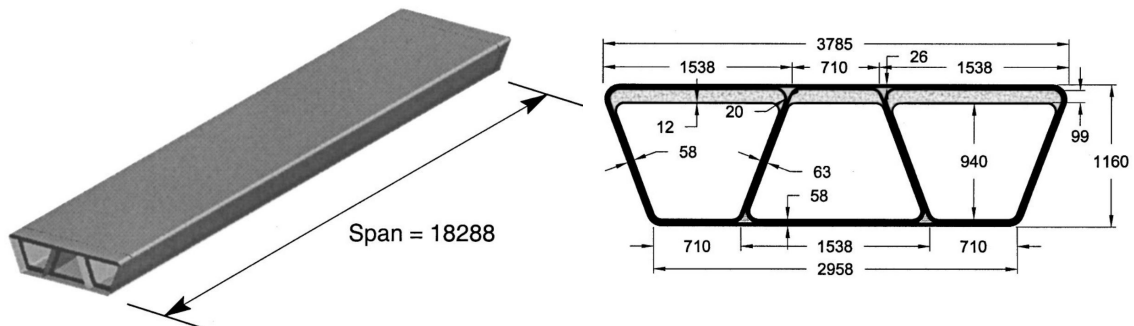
3D view and section of an FRP - concrete bridge deck. Concrete is placed in the compressive part of the section. [Kitane et al., 2004]
